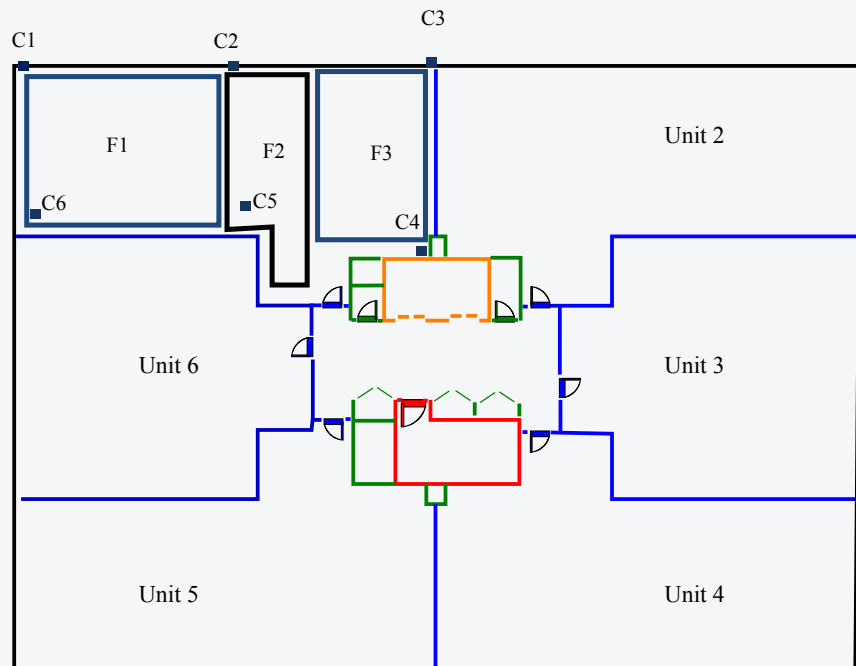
Schematic showing simple structural layout of an apartment in a steel building.
